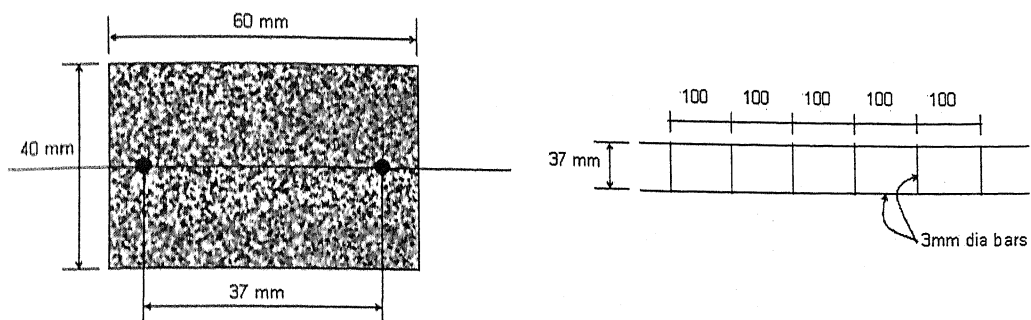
Cross section and reinforcement of confinement grid members used in specimen 1.
